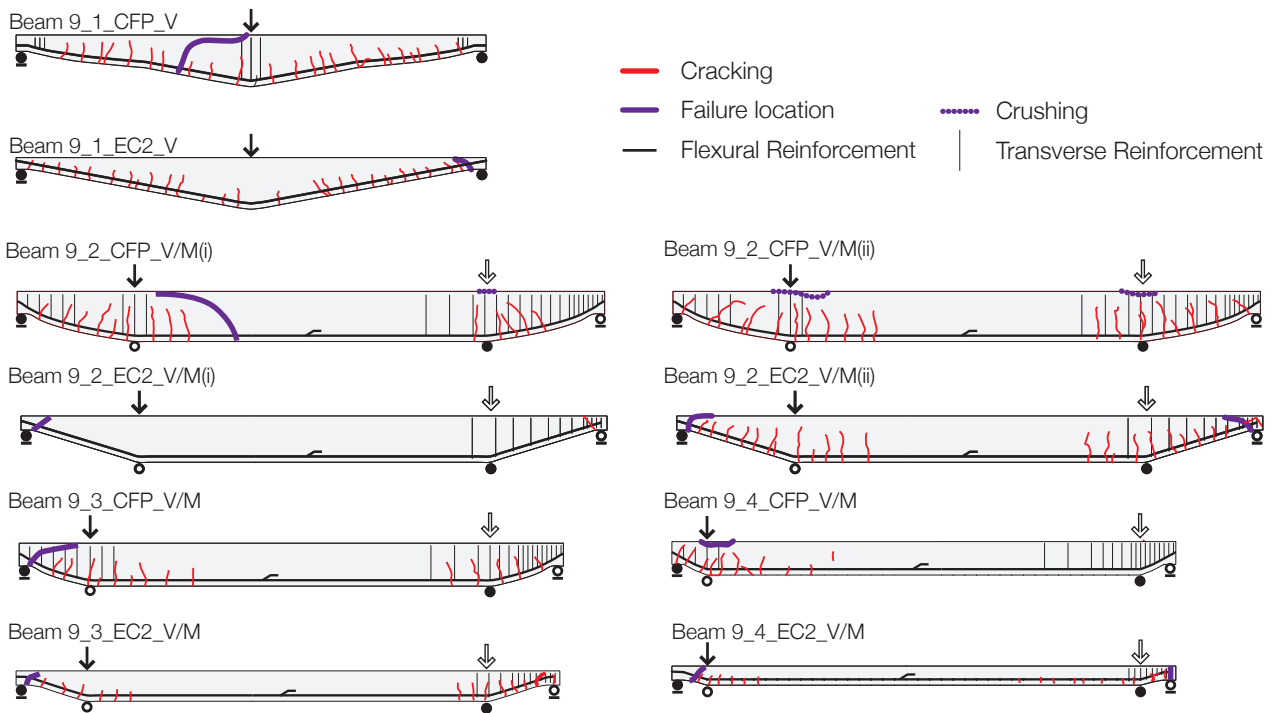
Crack patterns at failure for all EC2 and CFP beams tested.
